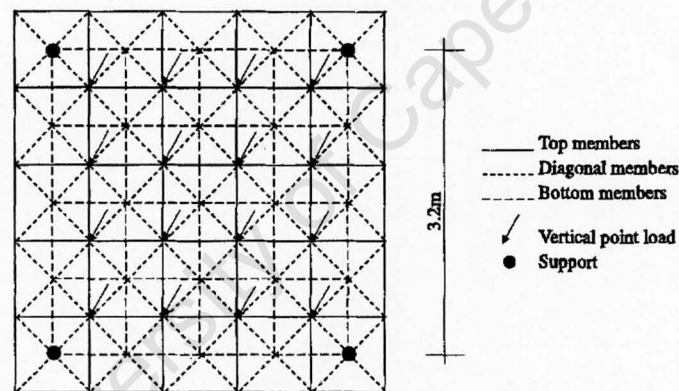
Double layer, corner supported, cornice, SOS truss as tested by El-Sheikh and McConnell (1993).
